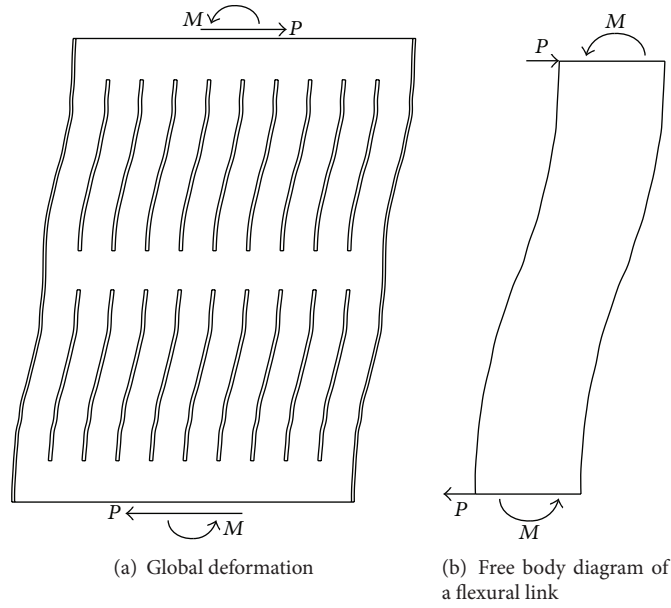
Lateral deformation of the steel slit wall subjected to horizontal loads.
